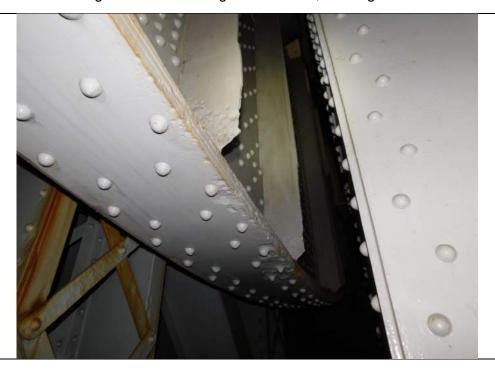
[Pier 4 Interior] -Girder 4W, West bottom flange and stiffener bases exhibit localized section loss, Looking Southeast
